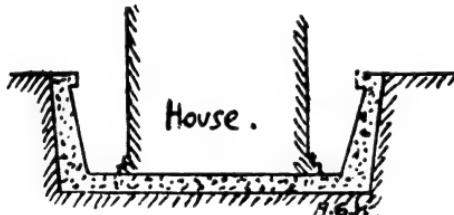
Foundation laid on Concrete Bed to avoid Subsoil Air and Water.
